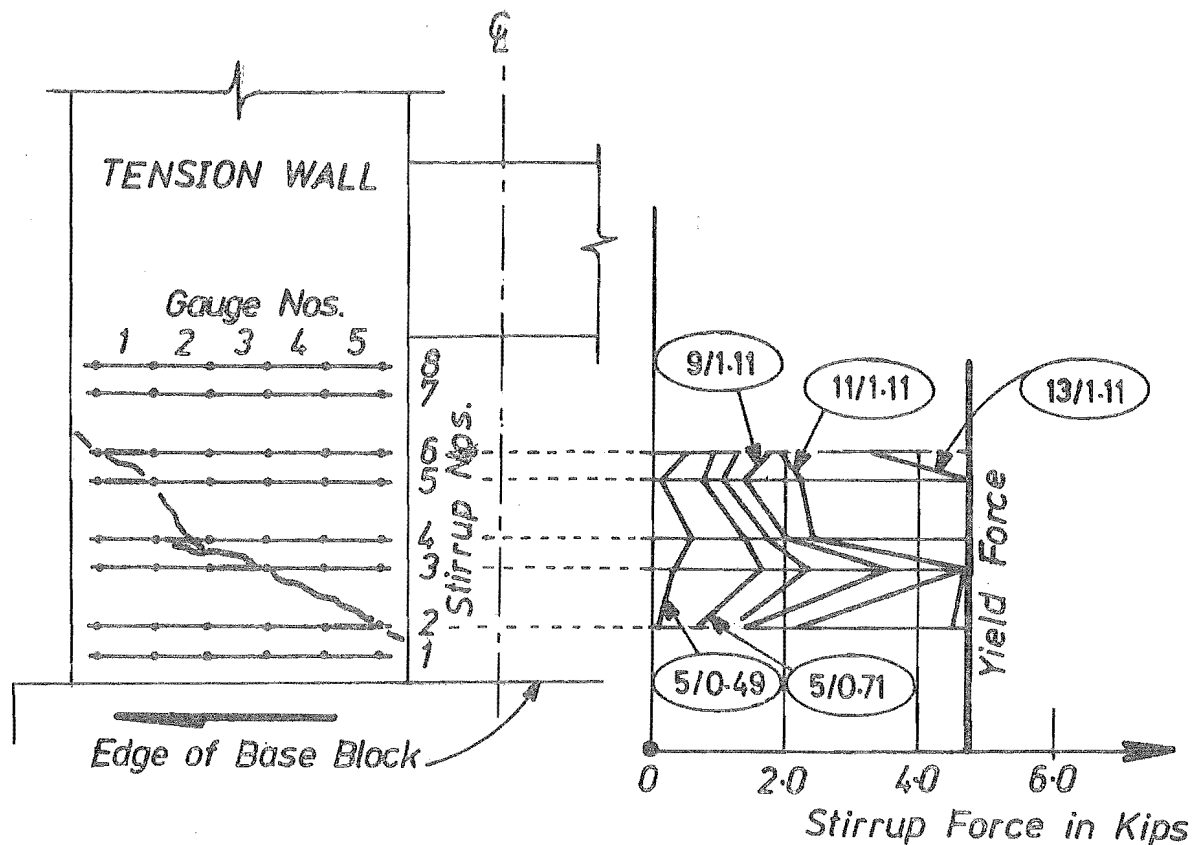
(a) STIRRUP FORCE VARIATION ACROSS A TYPICAL DIAGONAL CRACK IN THE LEFT WALL
